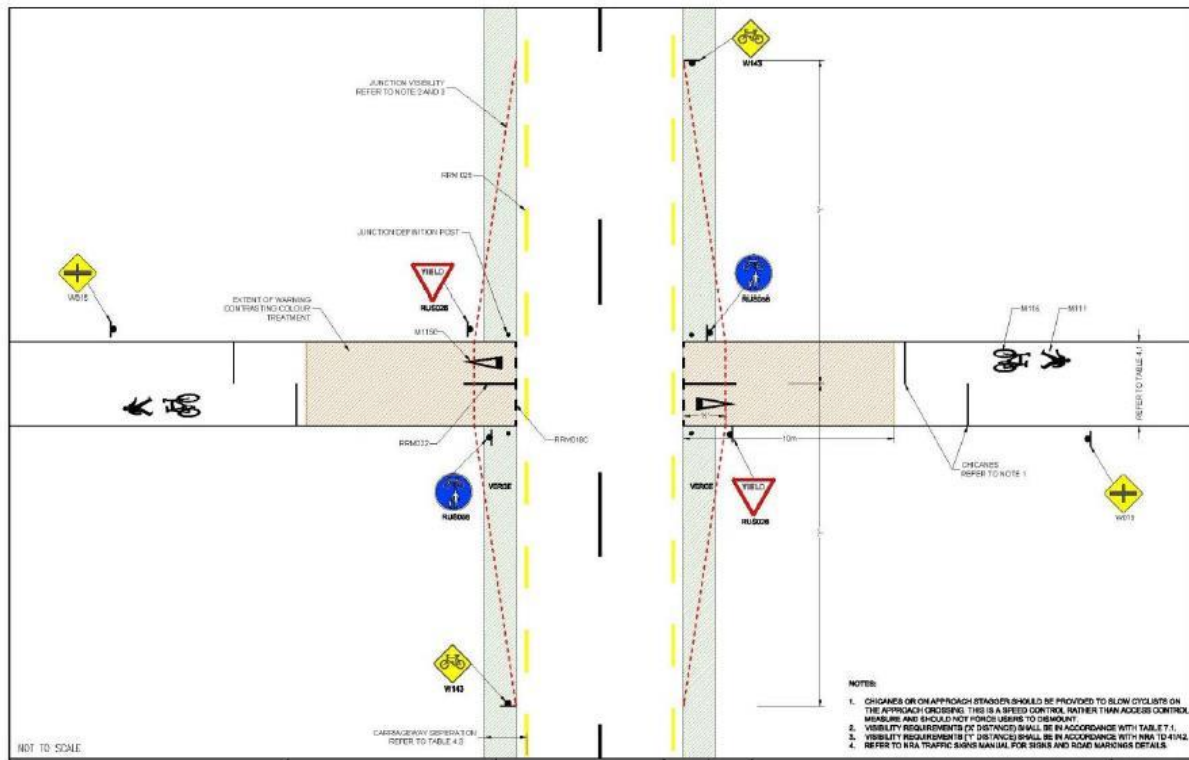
Greenway Crossing at Minor Road - TII's 2017 'Rural Cycleway Design (offline)'
